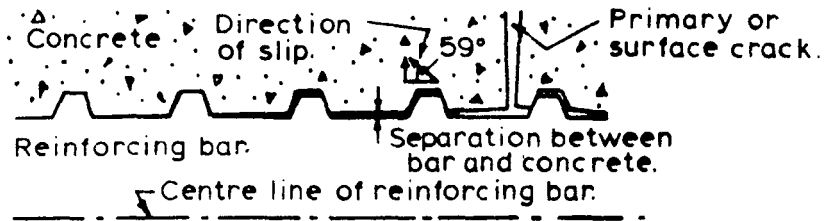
SECTION THROUGH REINFORCING BAR AND CONCRETE SHOWING SEPARATION THAT OCCURS NEAR A PRIMARY CRACK.
